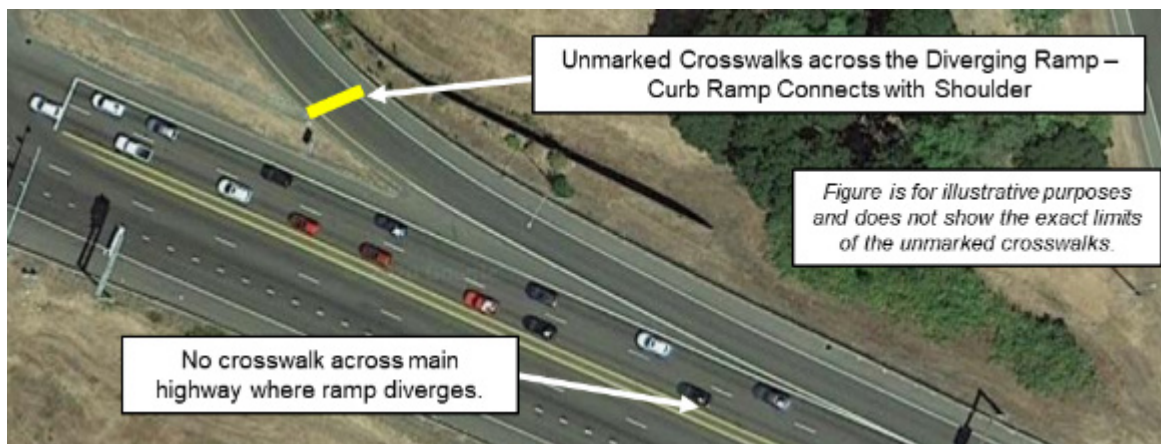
Unmarked Crosswalks Connecting Curb Ramps across Diverging Ramps
